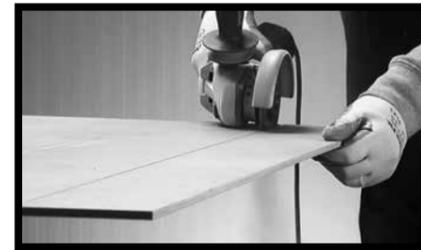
All versions of KERLITE can be cut using diamond discs fitted onto hand-held electrical grinding machines. Disc rotation speed must be high (>10000 RPM) and speed at which tool is pushed low (< 1 m/min). Depending on the type of disc and the length of the cut, it may be necessary to cool the disc with water. Recommended discs are the thin types generally used for cutting porcelain stoneware. The advantages of this type of cut include ease-of-execution and the possibility to cut during installation.
